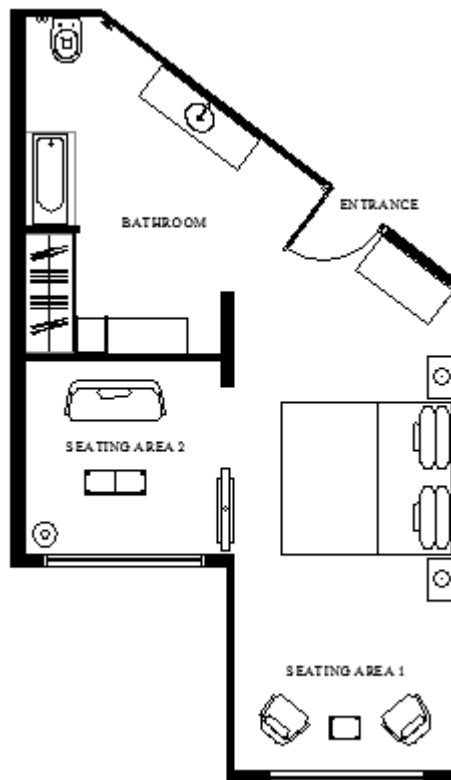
Plan of the experiment hotel guestroom (not to scale).
